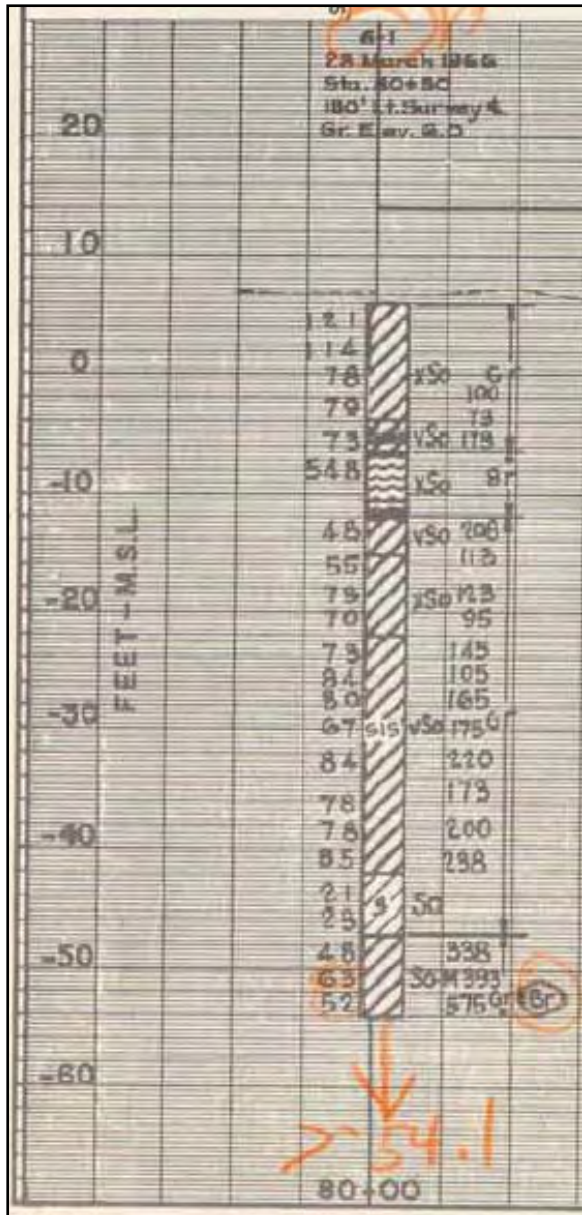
Nearest Boring at Sta 80+50, G-1, Circa 1966, From DM3, Plate 8. Original ground elevation was approximately 6 ft MSL, and surface soil was CH. Levee was built to approximate elevation +14 ft. circa 1970. Additional lift up to elevation 19 was added circa 1985
